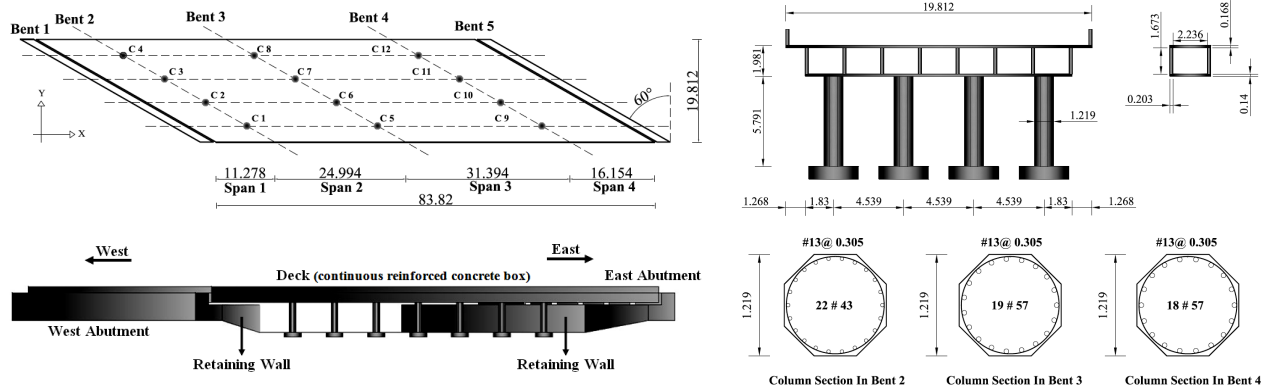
The plan, elevation, section of intermediate pier and cross section of columns of southeastern bridge of Foothill Boulevard Undercrossing (Unit: m).
